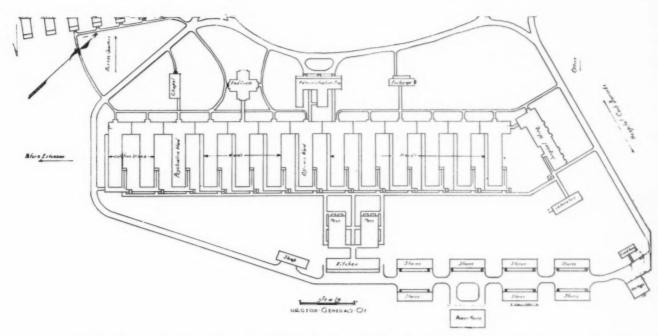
General plan, base hospital, Camp Knox, Ky., illustrating the new head-house type of hospital, developed to provide a more concentrated plan and one easier of administration (Surgeon-General's Office, October 10, 1918).
